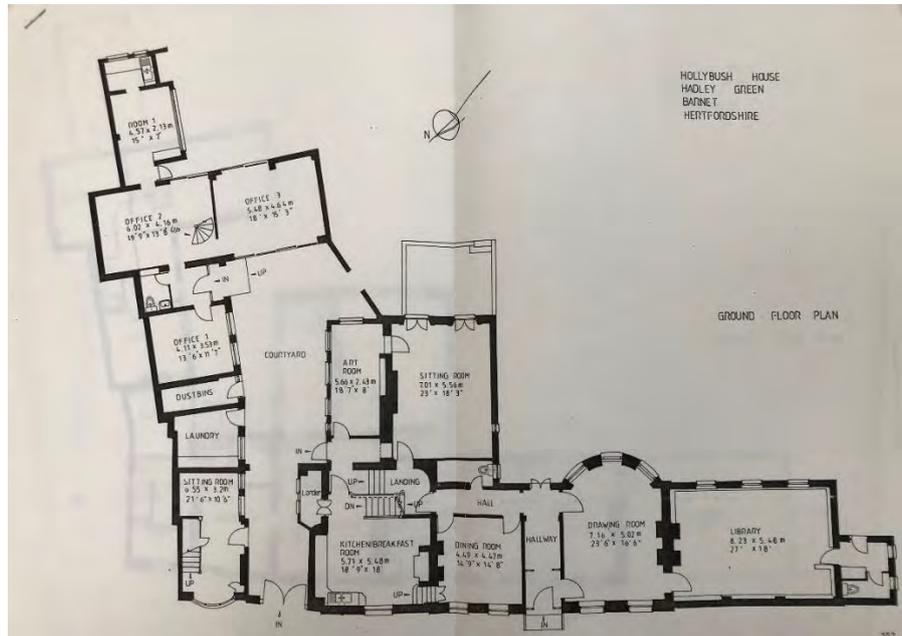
unusual layout to the ground floor of Hollybush House, 20<sup>th</sup> century Private collection
